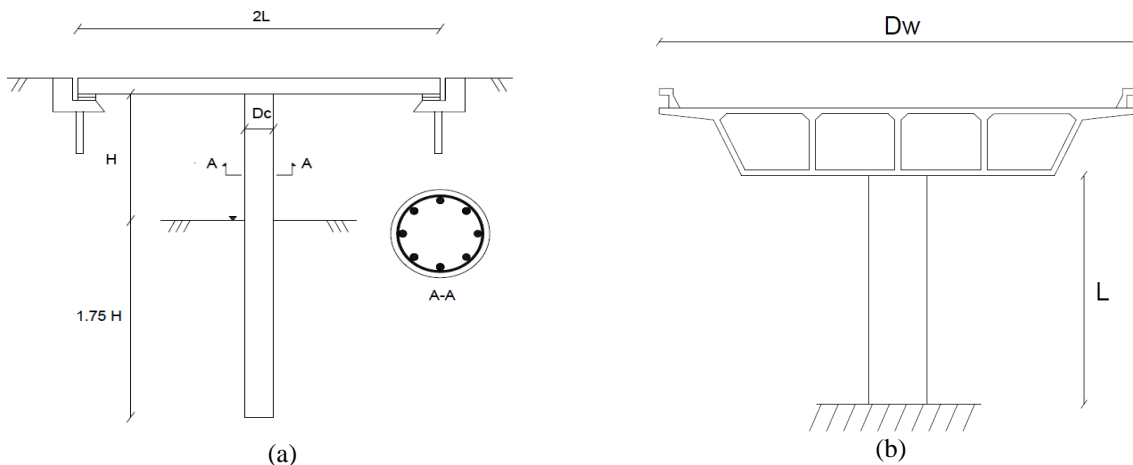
(a) Longitudinal view and (b) transverse view of single-frame box-girder concrete bridge
